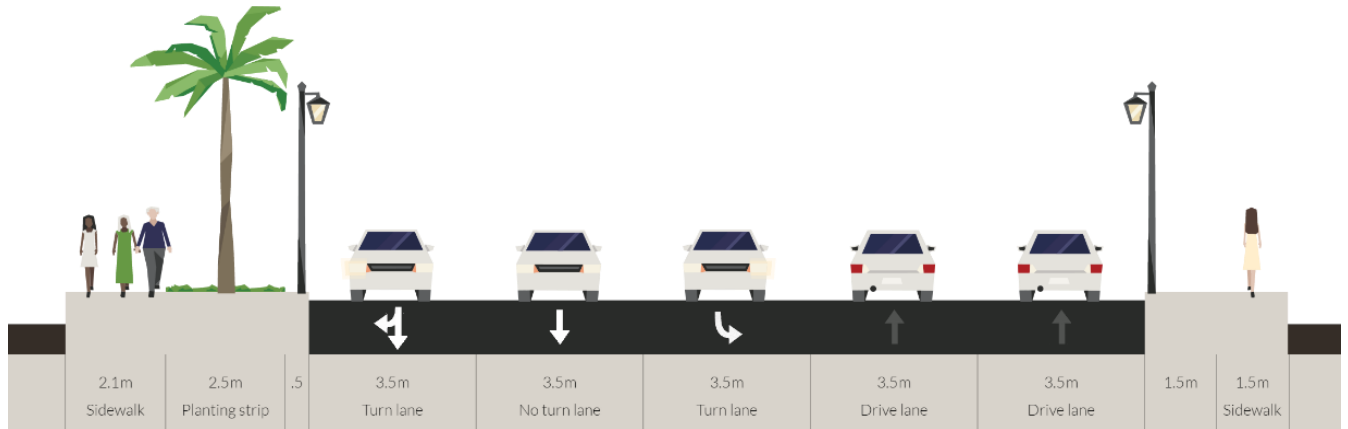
Existing Cross-section of Park Home Ave. at Beecroft Rd. (Looking East)
